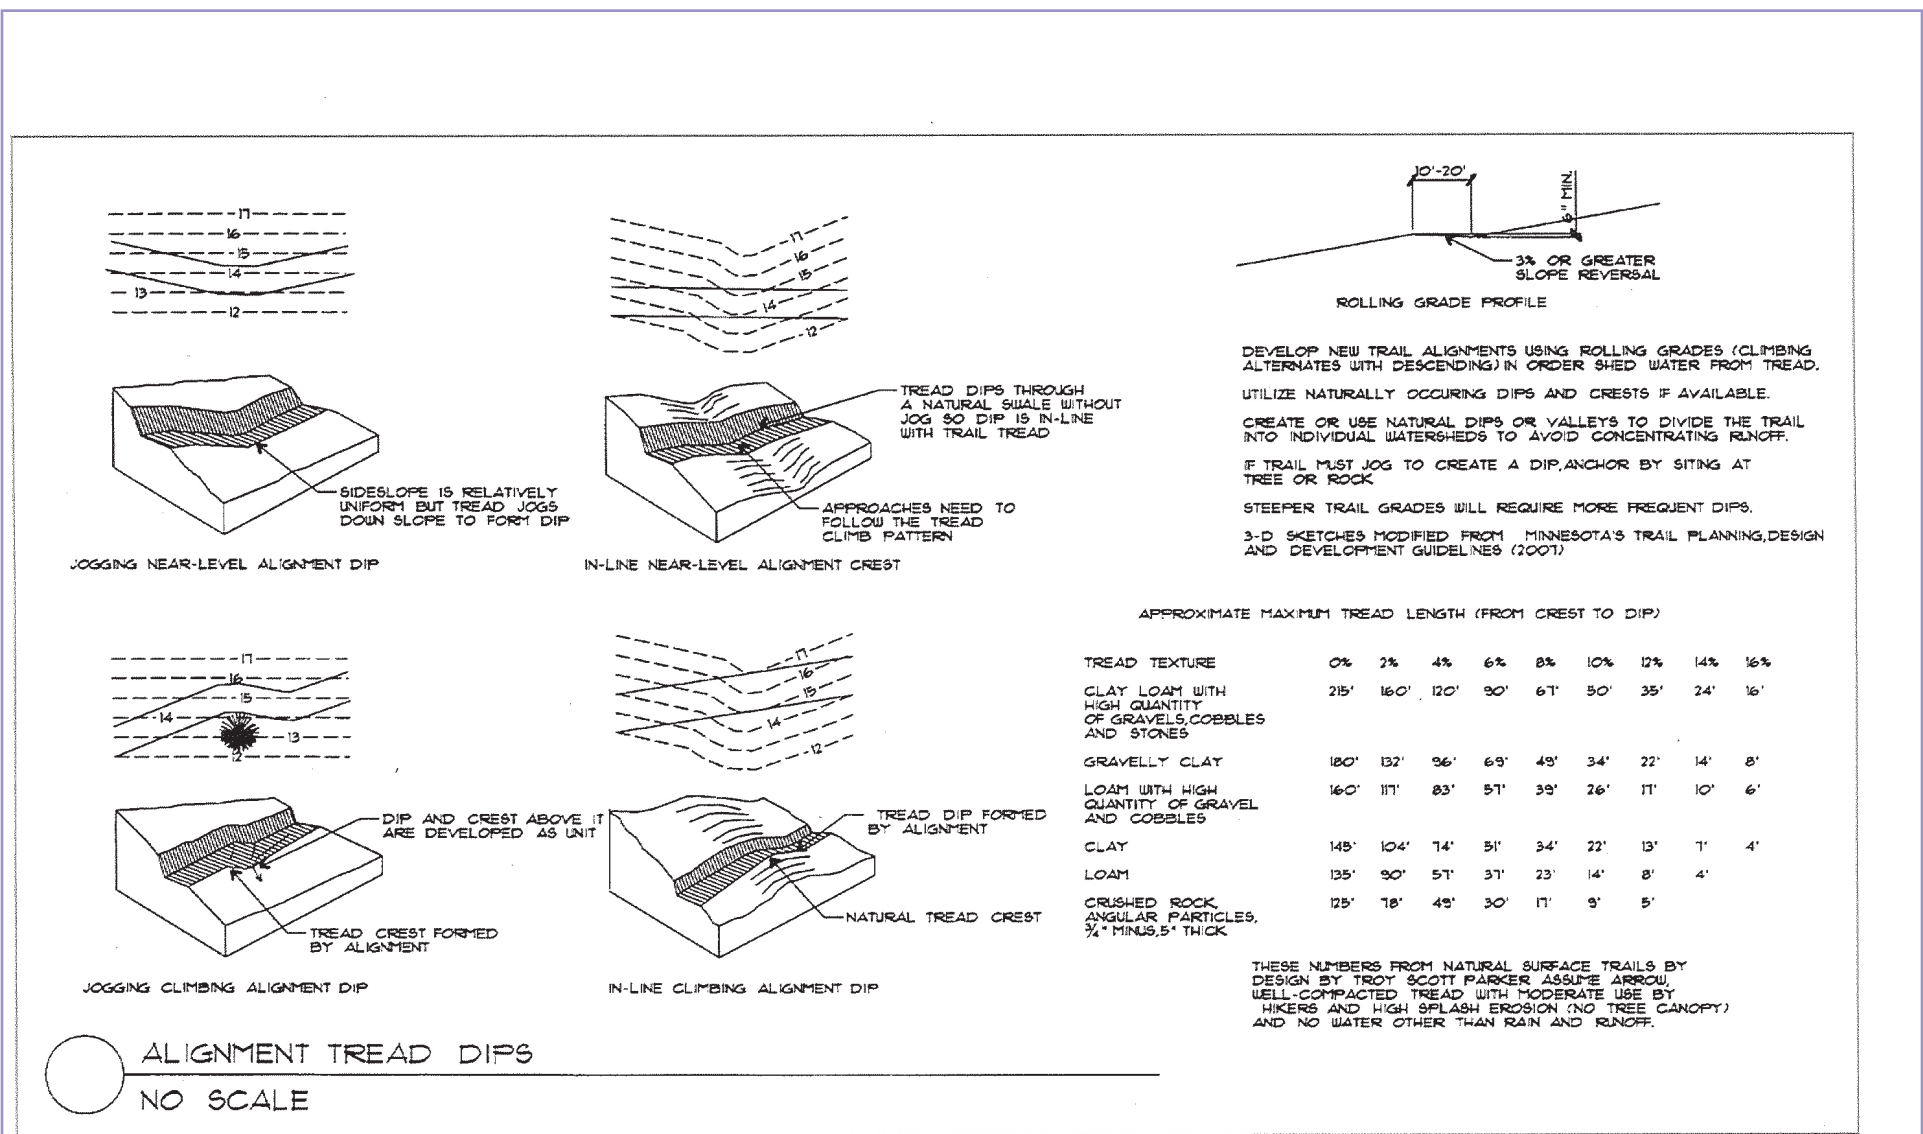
Alignment Tread Crests (Portland Trail Detail 14, pg. 67)
